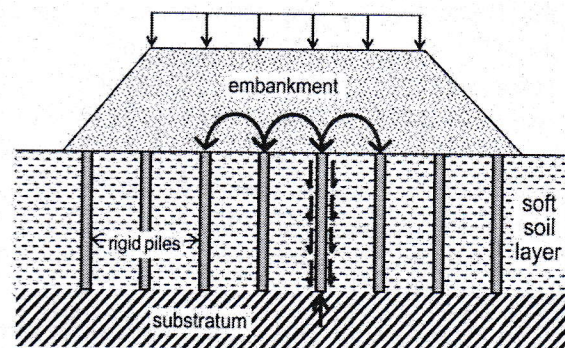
Sketch of an embankment reinforced rigid piles and soil arches by Hassen et al., 2009
